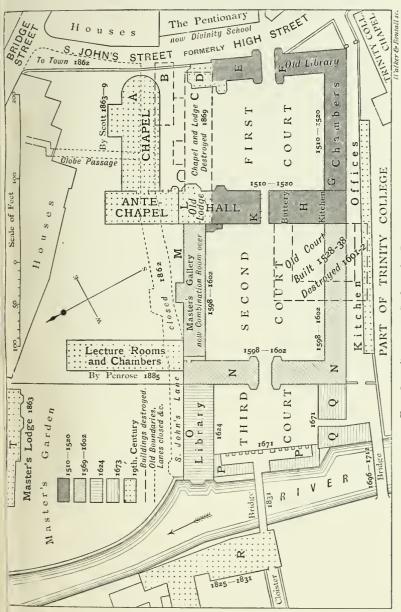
PLAN OF S. JOHN'S COLLEGE.
